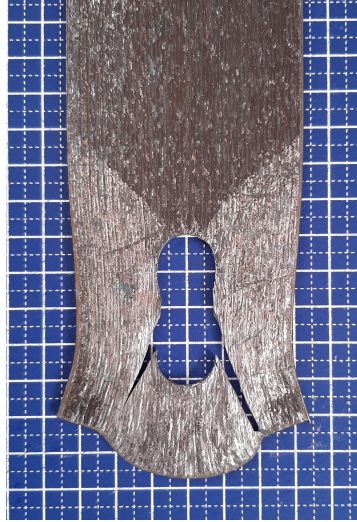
Bearing failure of bolted connection with large end distance
